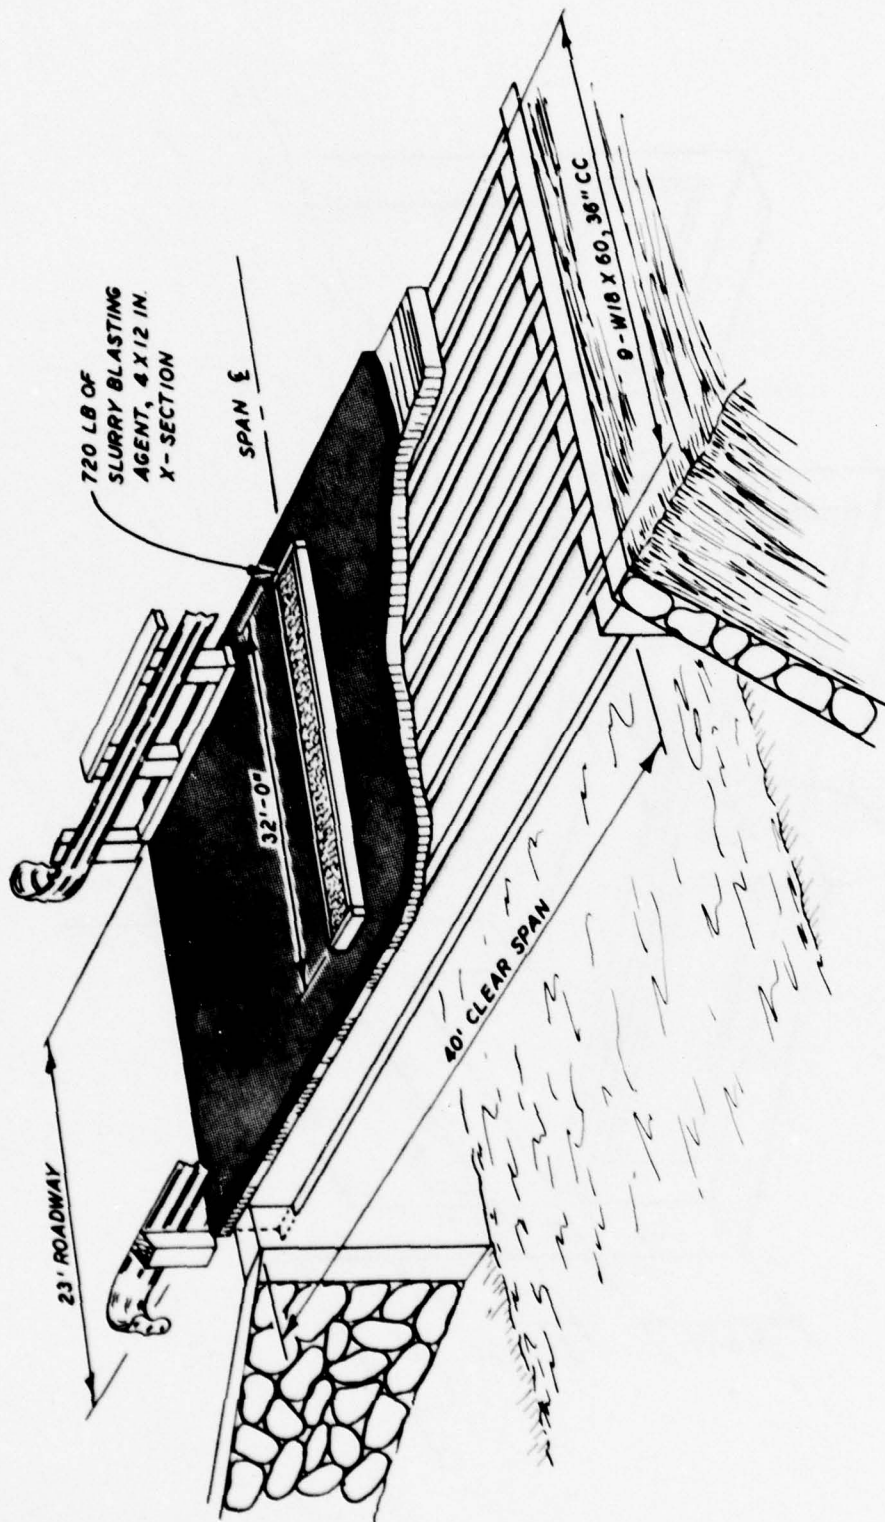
Coffee Run Bridge geometry and demolition plan.
